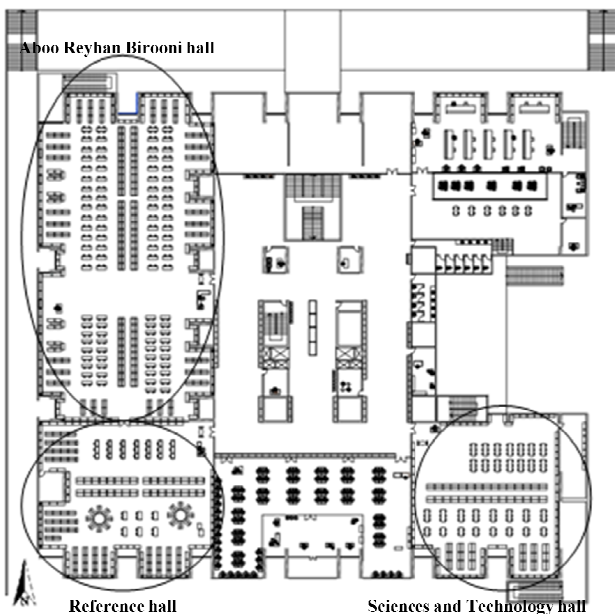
The plan of the building and the facilities of the first floor of the Central Library of Tehran University
